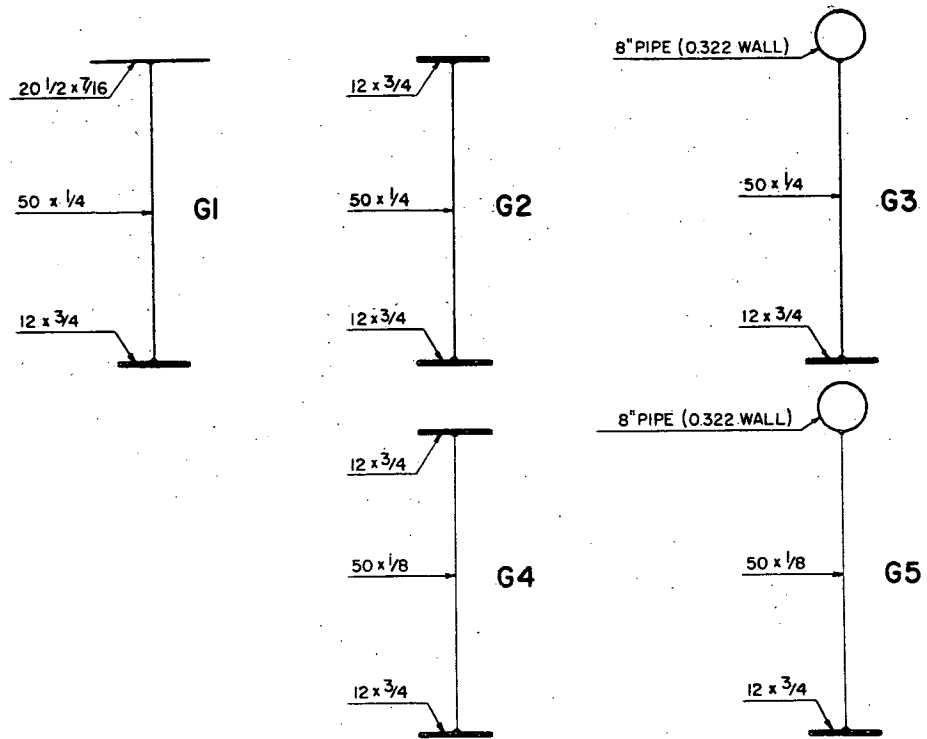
CROSS SECTION OF GIRDERS G1 TO G5
